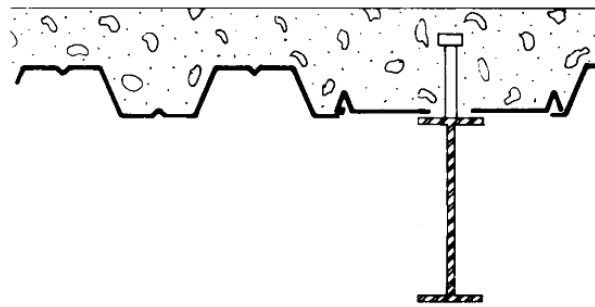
View of the Deck Flutes Parallel to the Beam. Adapted from Vulcraft Steel Roof and Floor Deck Catalog, 2001. Used with permission.
